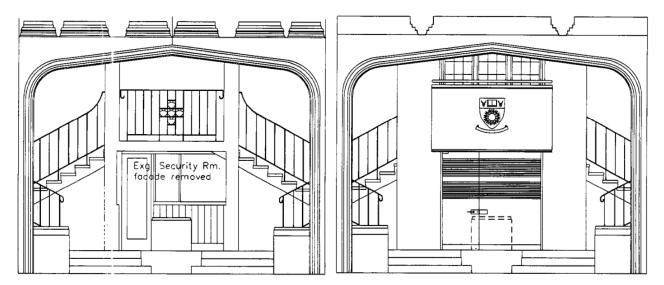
(left): Existing interior elevation of wall addressing front entrance in March 2000 (ref: 00/0905). Figure 72 (right): Proposed interior elevation of wall addressing front entrance in March 2000 (ref: 00/0905).
